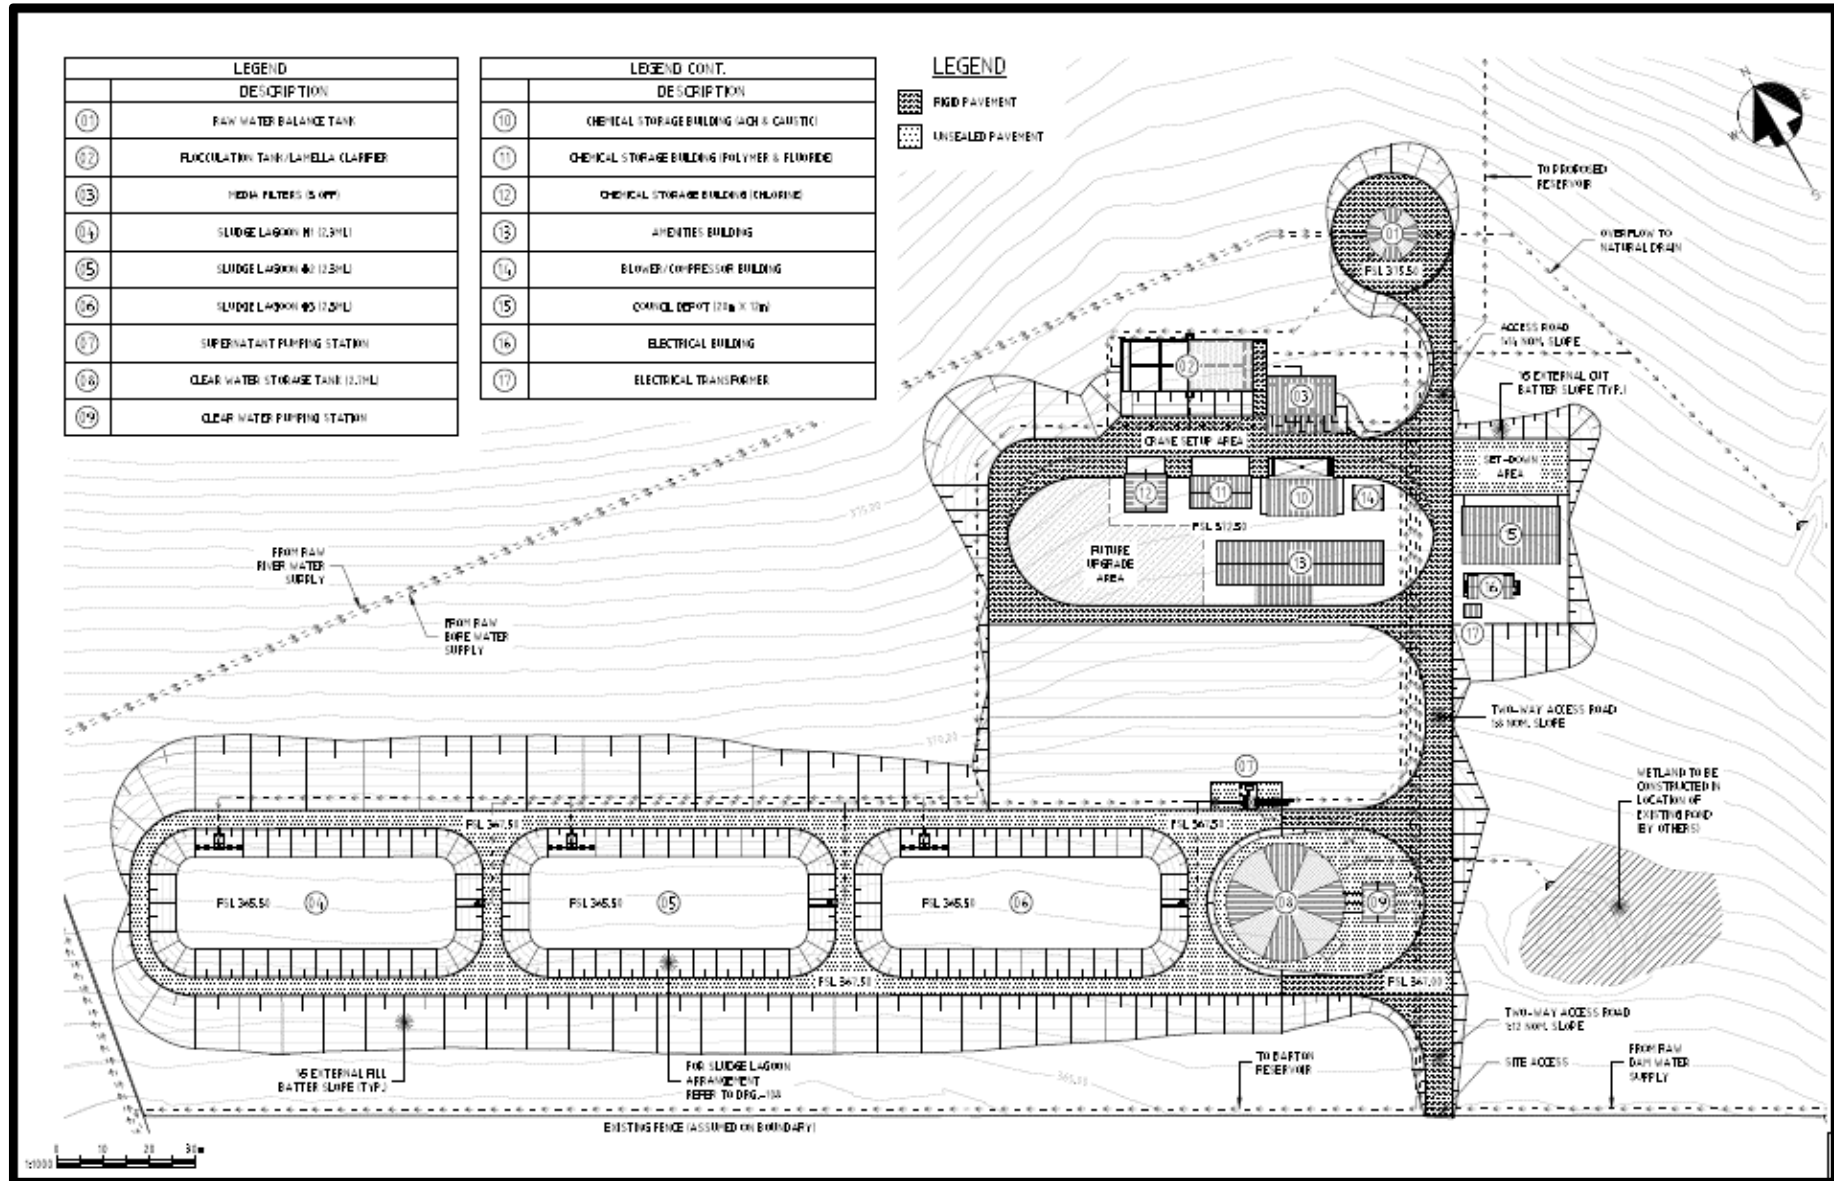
Proposed Parkes Water Treatment Plant General Arrangement
